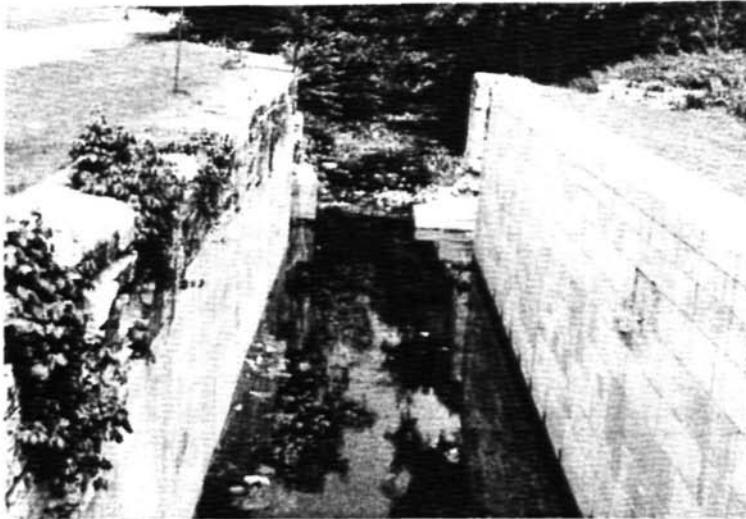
shows the present condition of Lock 1 and the condition of the canal upstream and downstream of Lock 1. Lock 1 has been partially stabilized, but the renovation work needs to be completed along with the addition of a water-level control weir or new gates at the lock to control the water level upstream of the lock.
